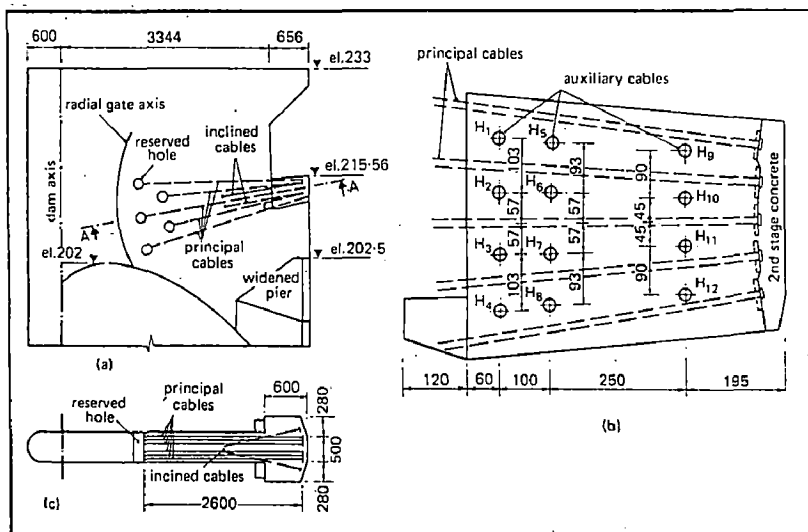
6.13. (a) Prestressed gate piers at the Yantan project; (b) A-A cross section; and, (c) detail of the pier anchor blocks (dimensions in cm).
